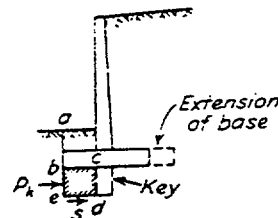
Horizontal forces resisting movement of key beneath retaining wall.
